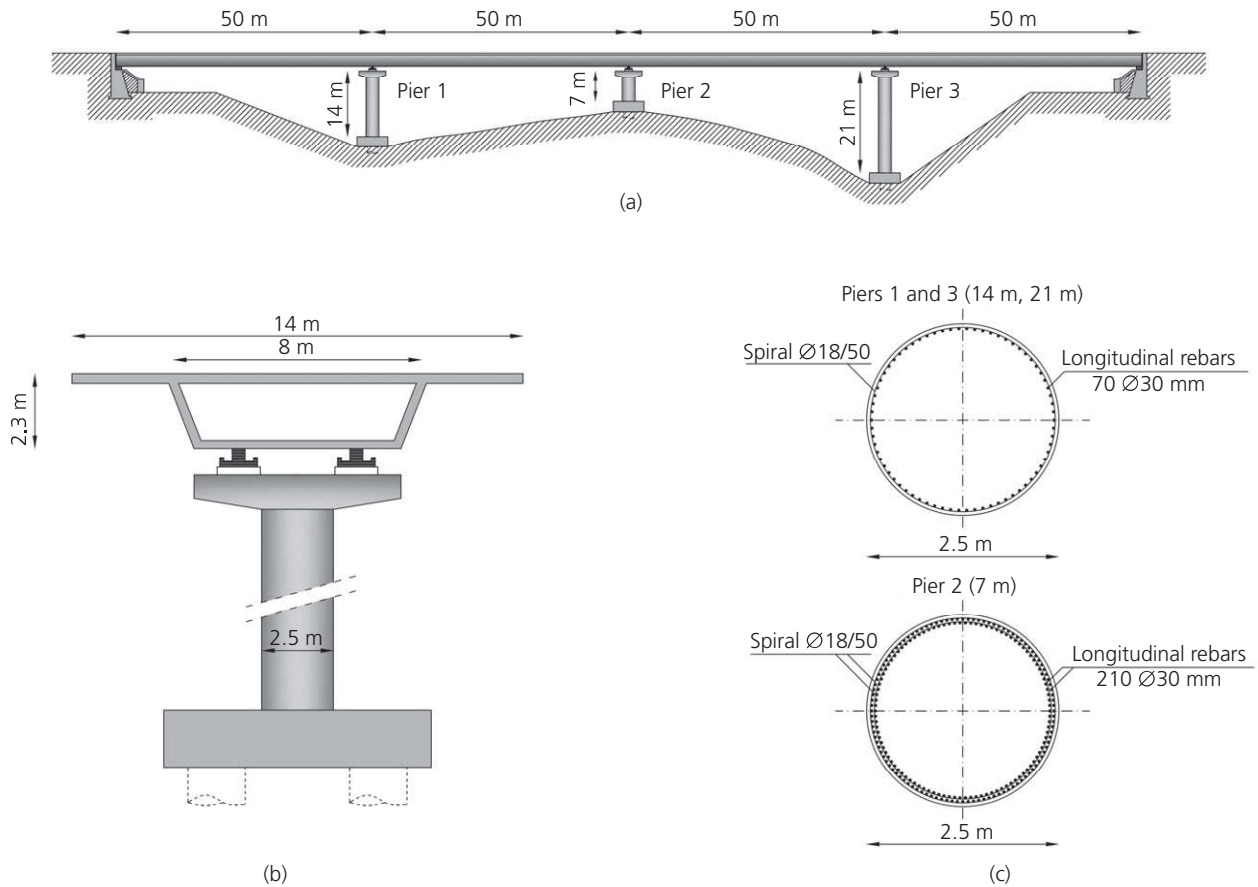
Layout of the considered RC bridge: (a) longitudinal view showing column heights and span lengths; (b) elevation view of generic bridge column; (c) cross-sections of bridge columns
